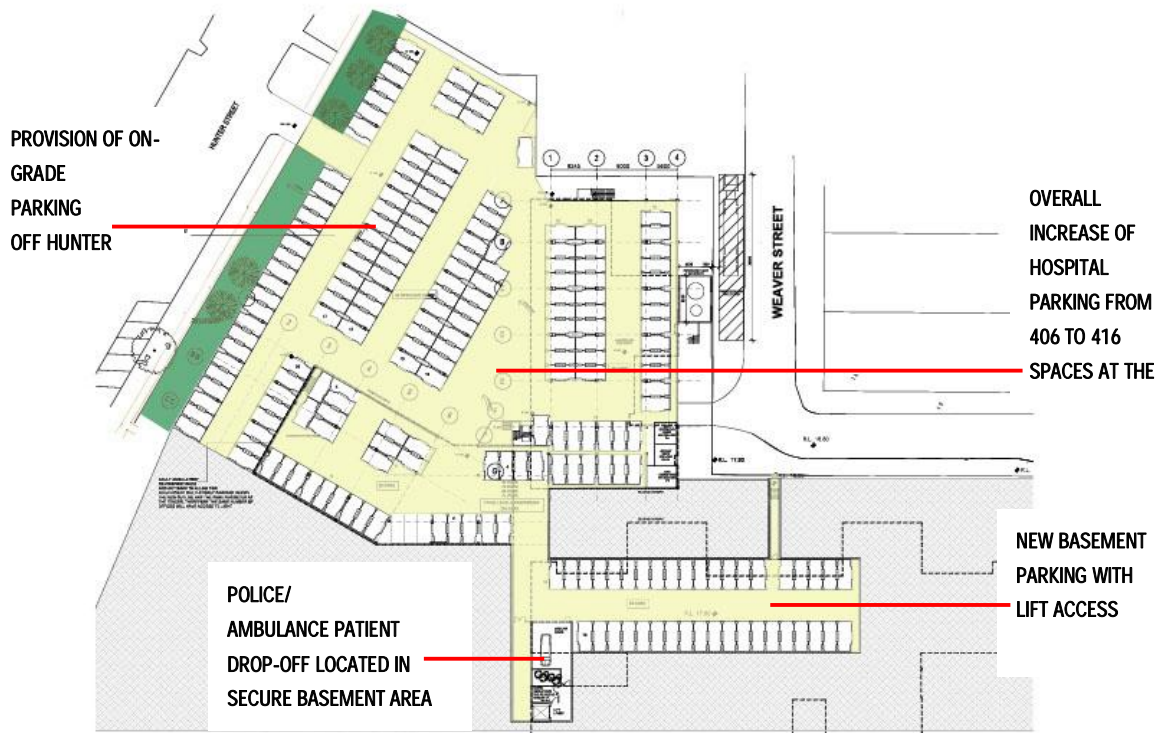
STAGE 1 NEW PSYCHIATRIC FACILITY REVISED MASTER PLANNING LEVEL 0
